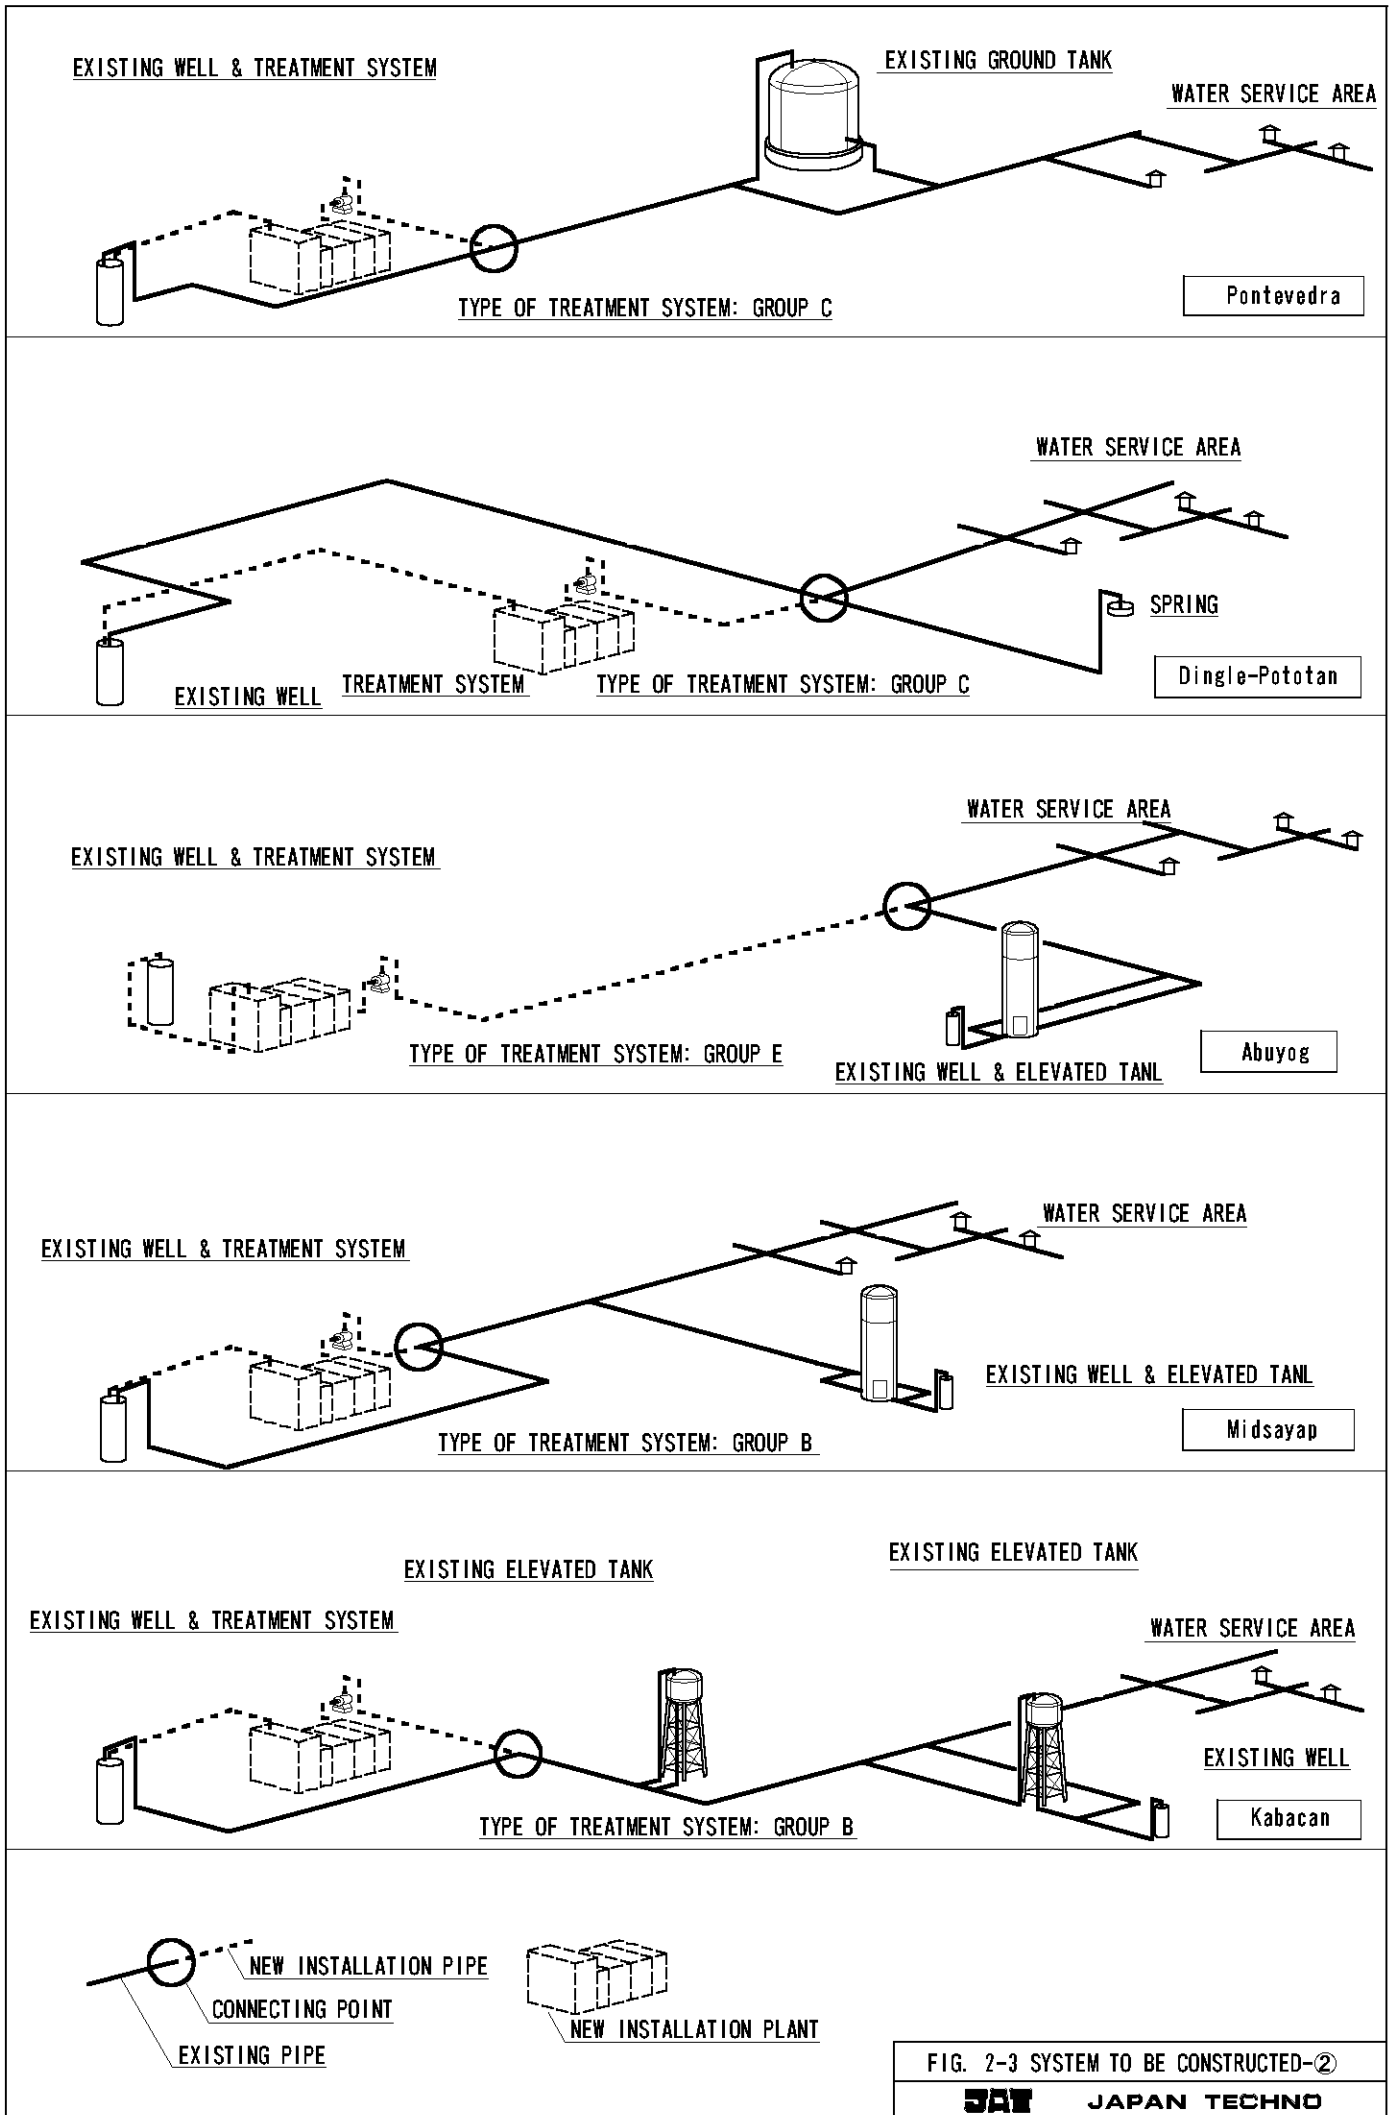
SYSTEM TO BE CONSTRUCTED-2
